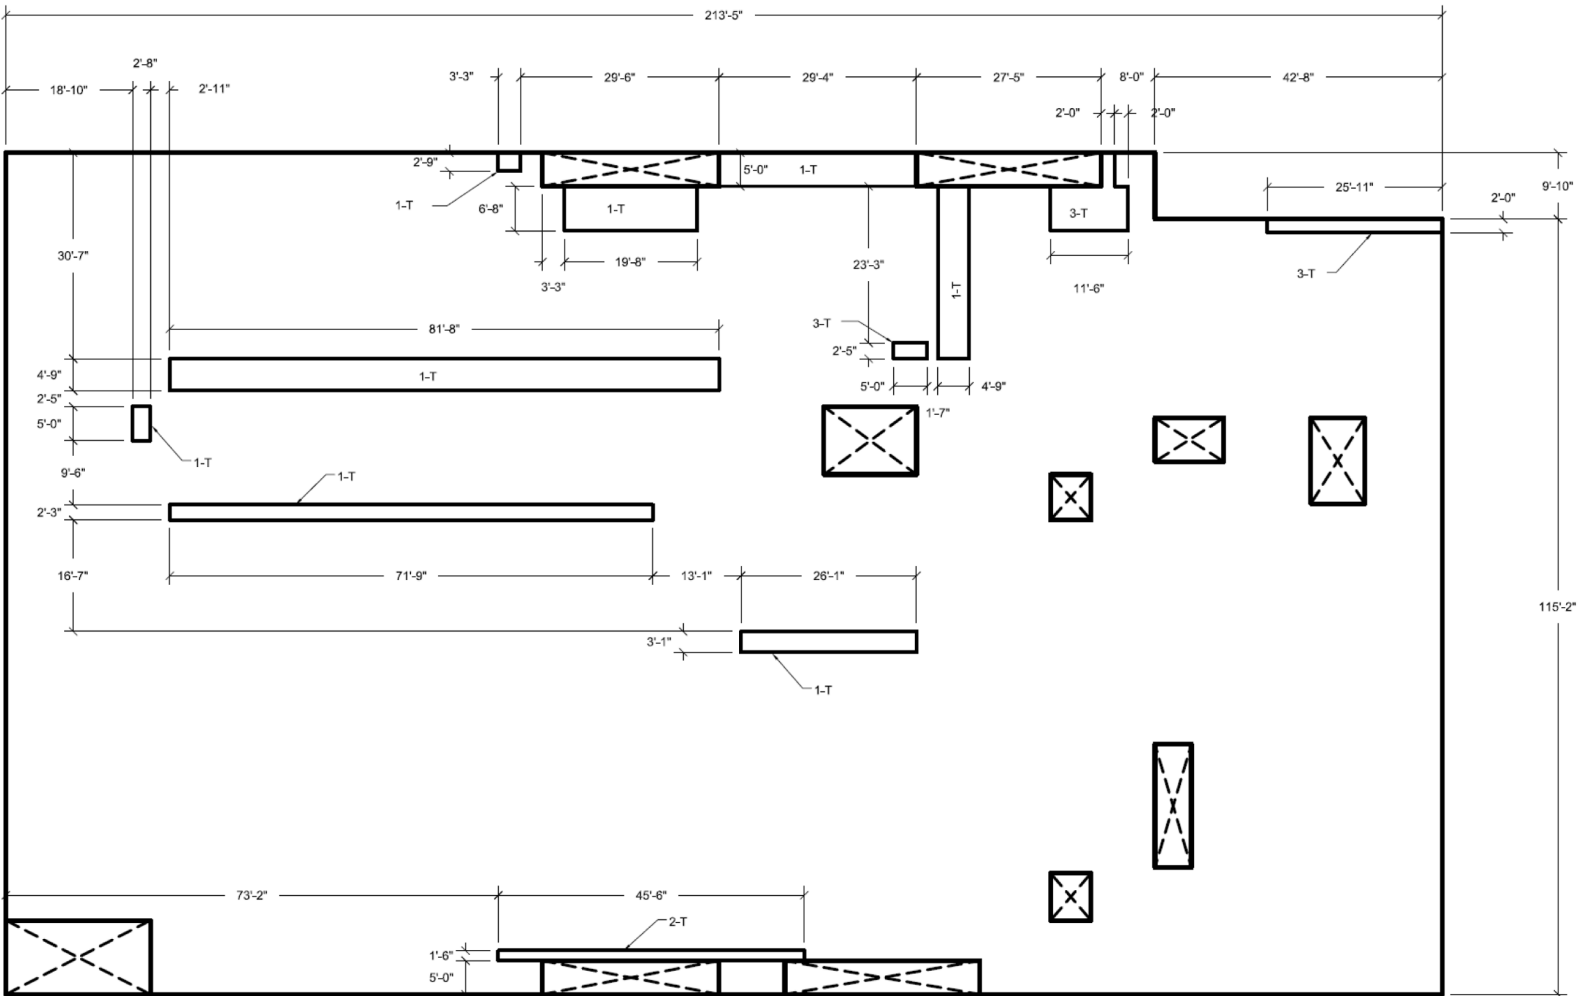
H.3-37a RWB Elevation 35 Looking Down Transverse Reinforcement Zones
